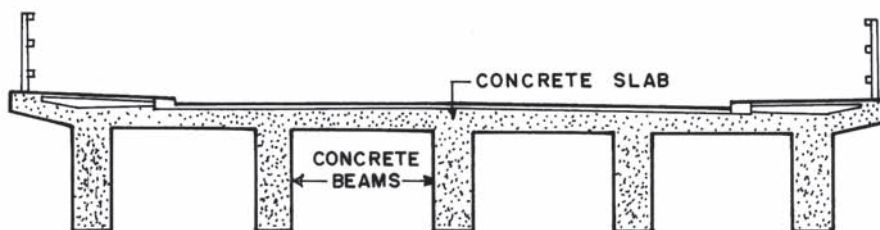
BEAM AND SLAB CONSTRUCTION
